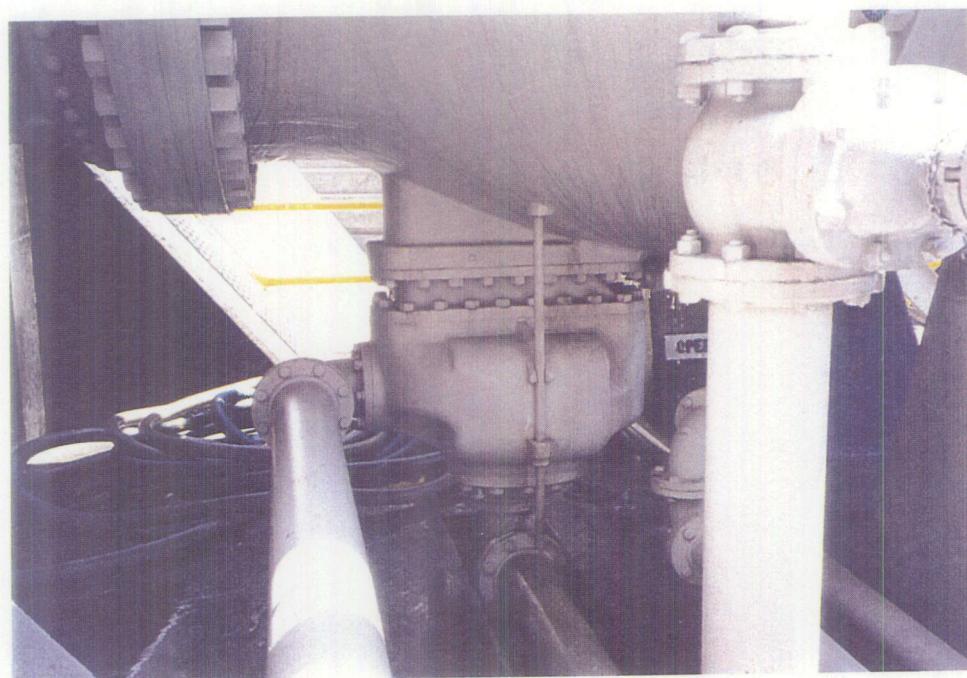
Morris Dam - Needle Valve 3 - View showing needle valve paradox valve and piping. 07/01/98
